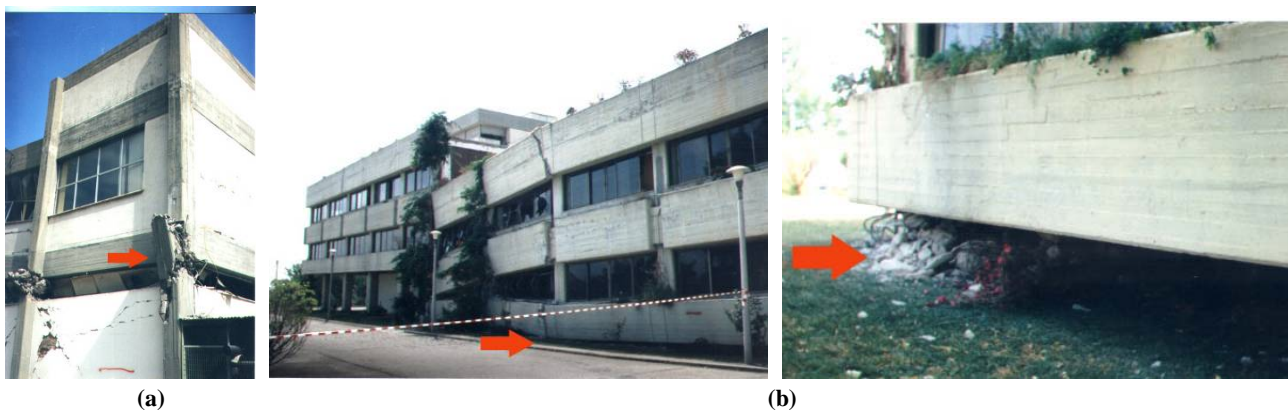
(a) Short column failure; (b) Total collapse of ground floor (failure of all ground floor “soft story” columns).
